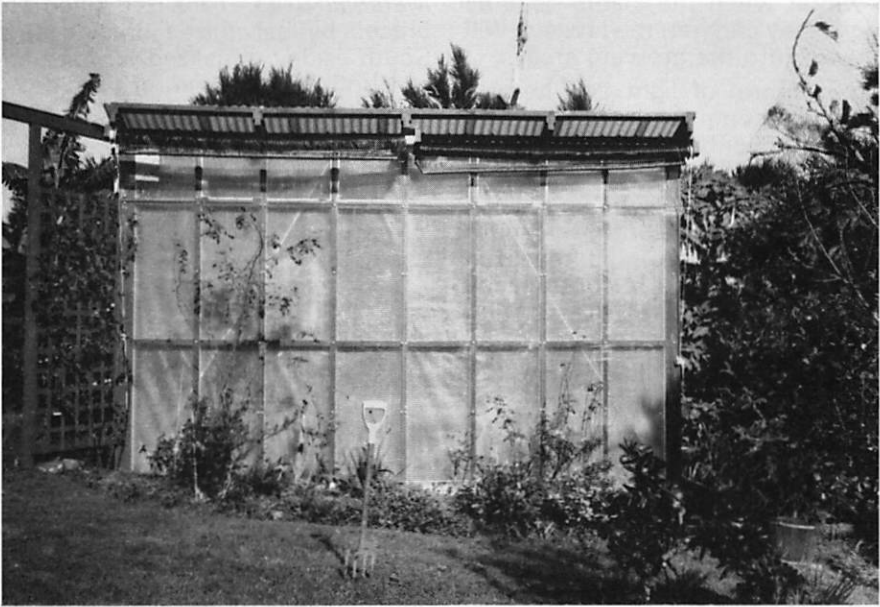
North Facing Wall. Taken mid-winter at noon. Notice shadow cast by garden fork.
